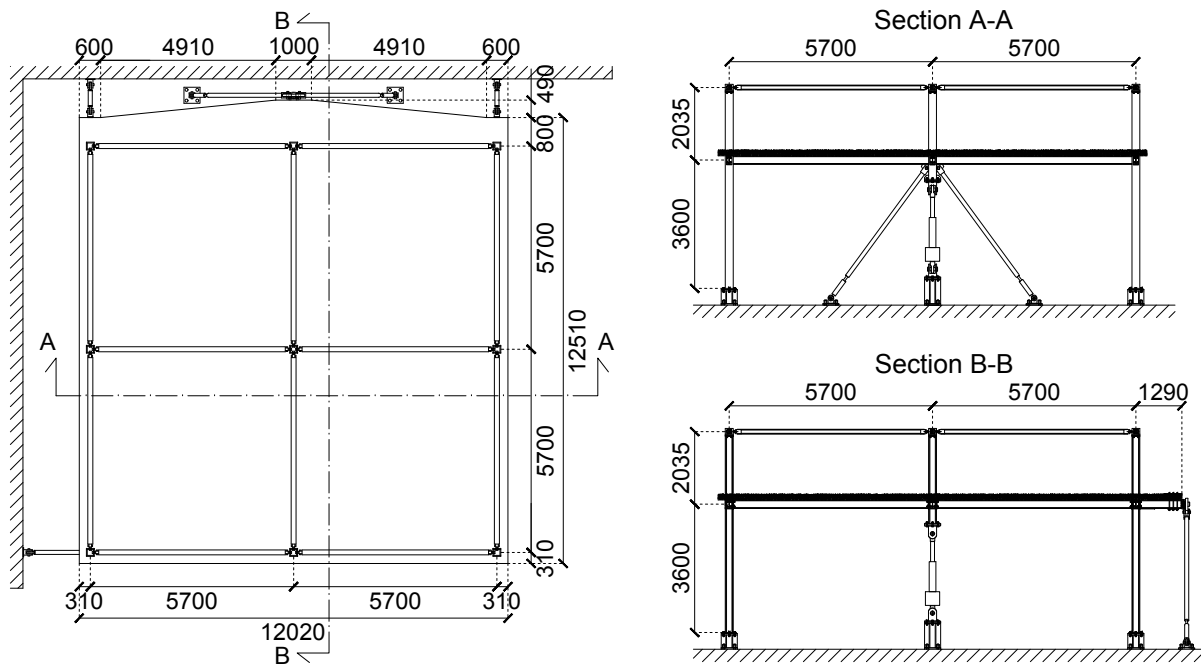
Plan view and sections of the symmetric sub-frame (measures in mm)
